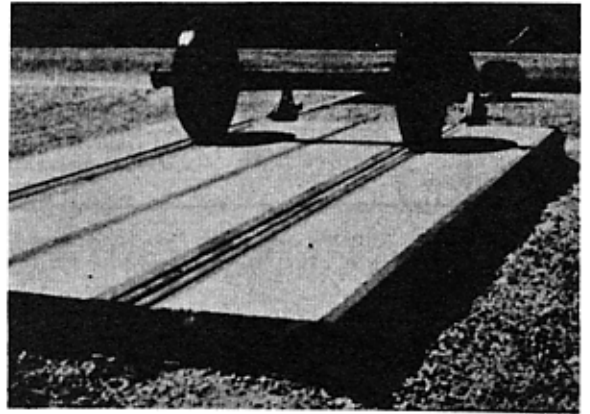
Precast concrete plank with rubber flangeway filler.
